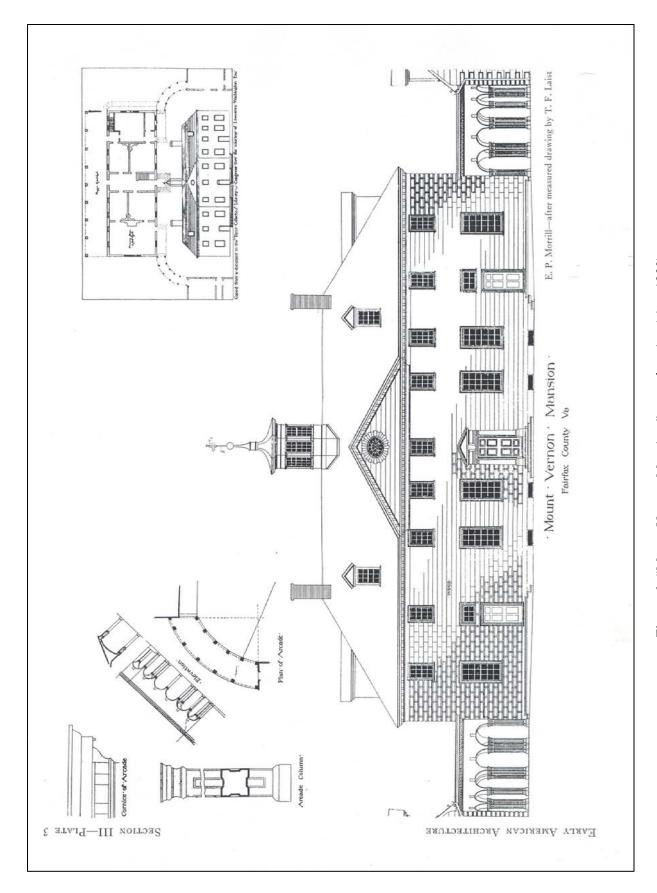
"Mount Vernon Mansion," west elevation (circa 1920).
